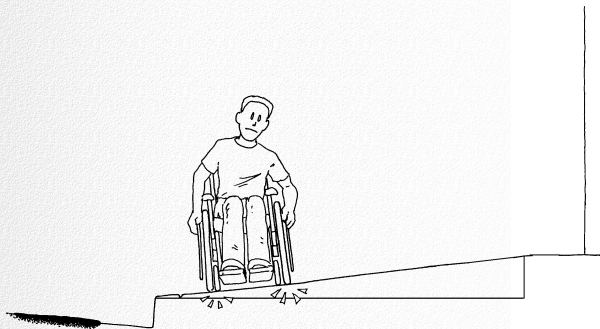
POTENTIAL PROBLEM: Using steep cross slopes to mitigate between building and street elevations should be avoided because steep cross slopes make it difficult for wheelchair users and others to travel on the sidewalk.
